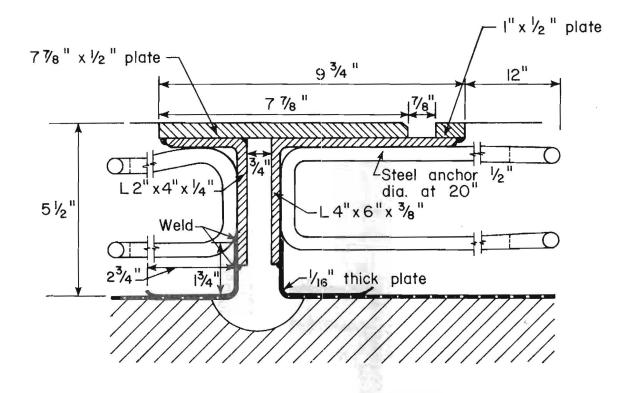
COVERED JOINT FOR AIRFIELD PAVEMENTS IN GERMANY
